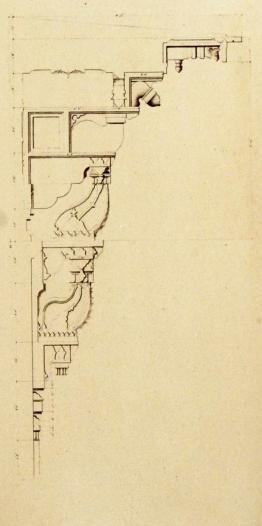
DETAIL DRAWING OF THE PRINCIPAL MOULDING
